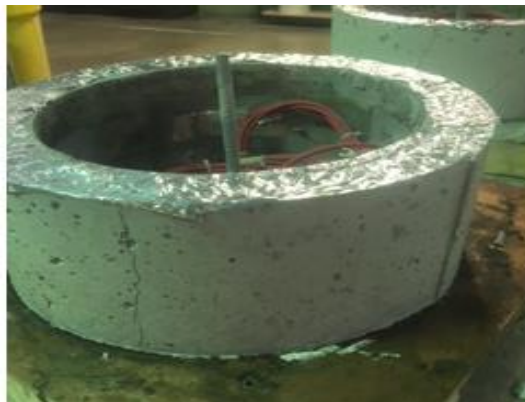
Typical Restrained Shrinkage Specimen after Failure
